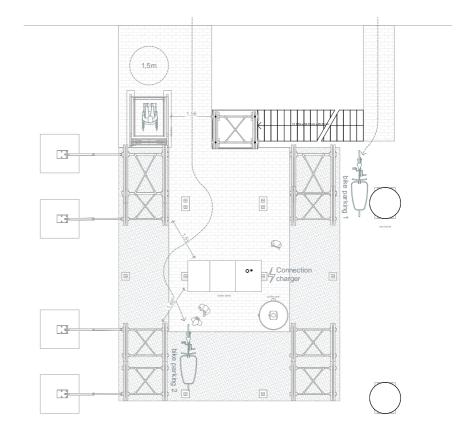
16. Floor plan HDU with parking space and passenger way
